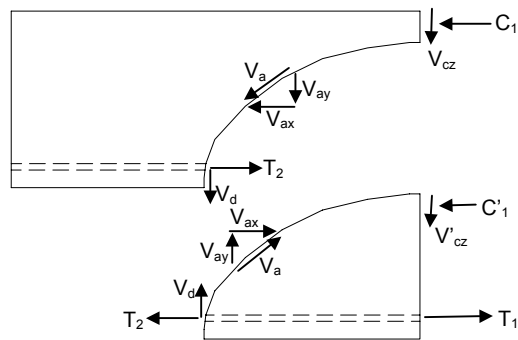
Internal forces in a cracked beam without stirrups (adapted from MacGregor and Bartlett 2000)
